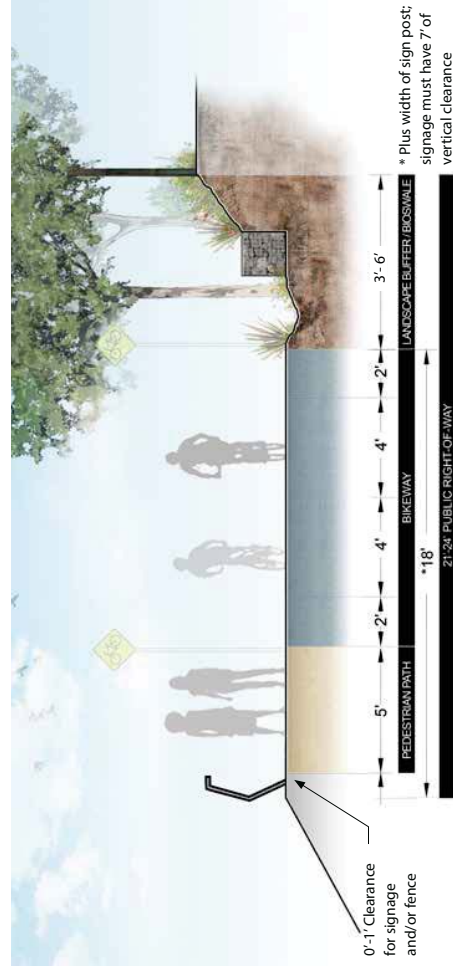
Vanalden Avenue - Typical Cross Section
